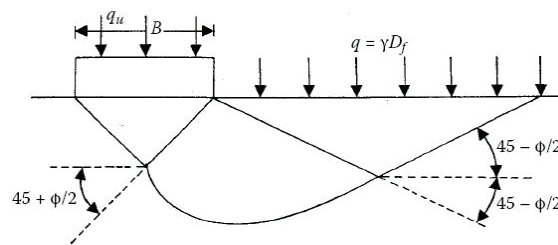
Modified failure surface in soil supporting a shallow foundation at ultimate load (Das, 2009).
